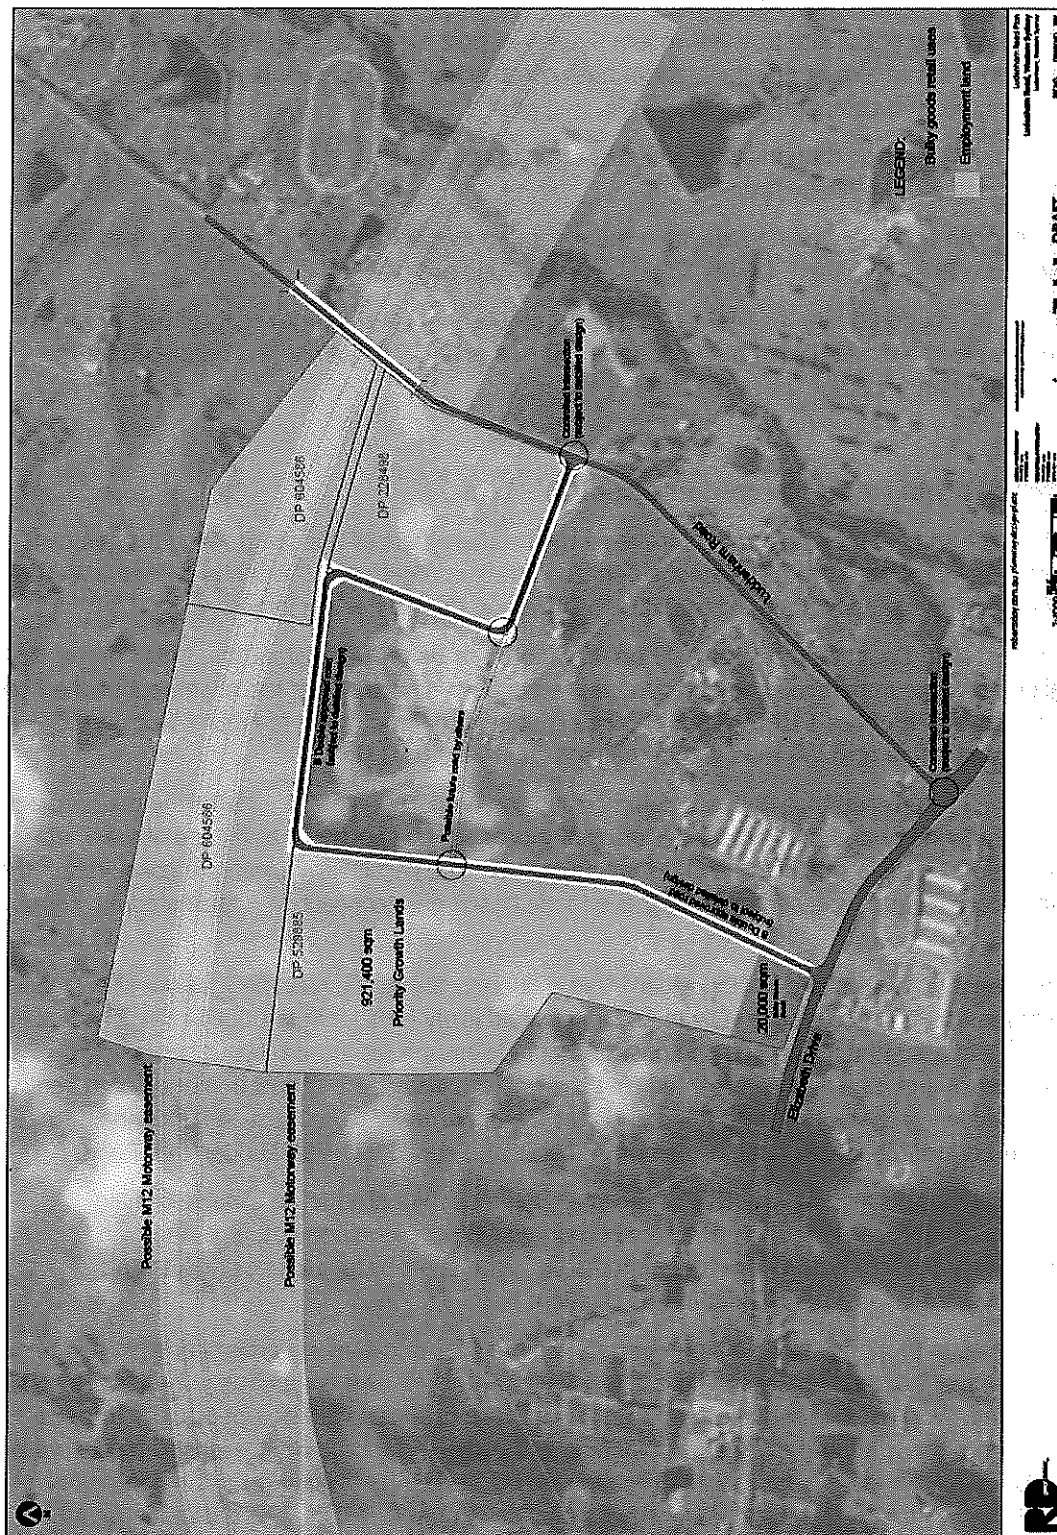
Concept Layout for Elizabeth Drive/Luddenham Road
